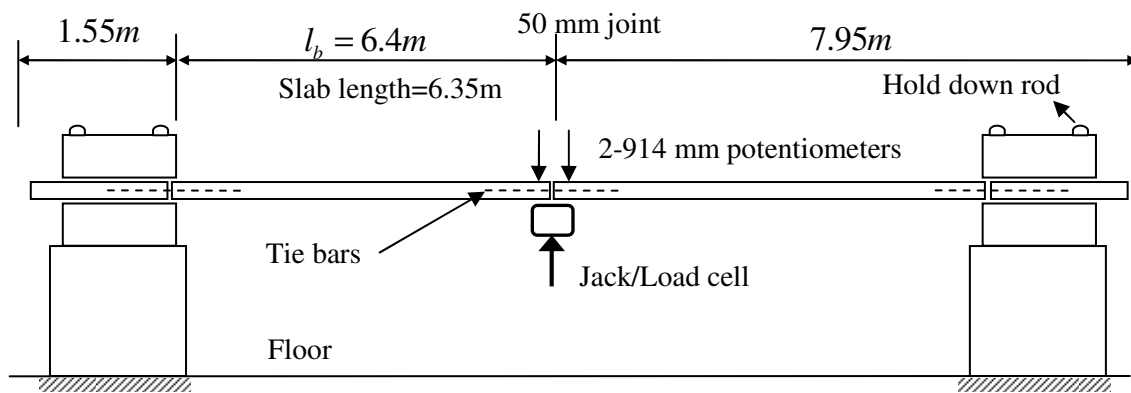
Two floor-to-floor test specimens (PCA, 1975-1979)
